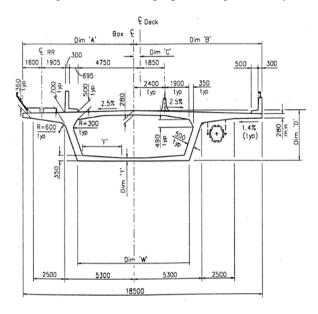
Typical deck section at mid-span (Source: Contract drawing of Jamuna Multipurpose Bridge Authority)
